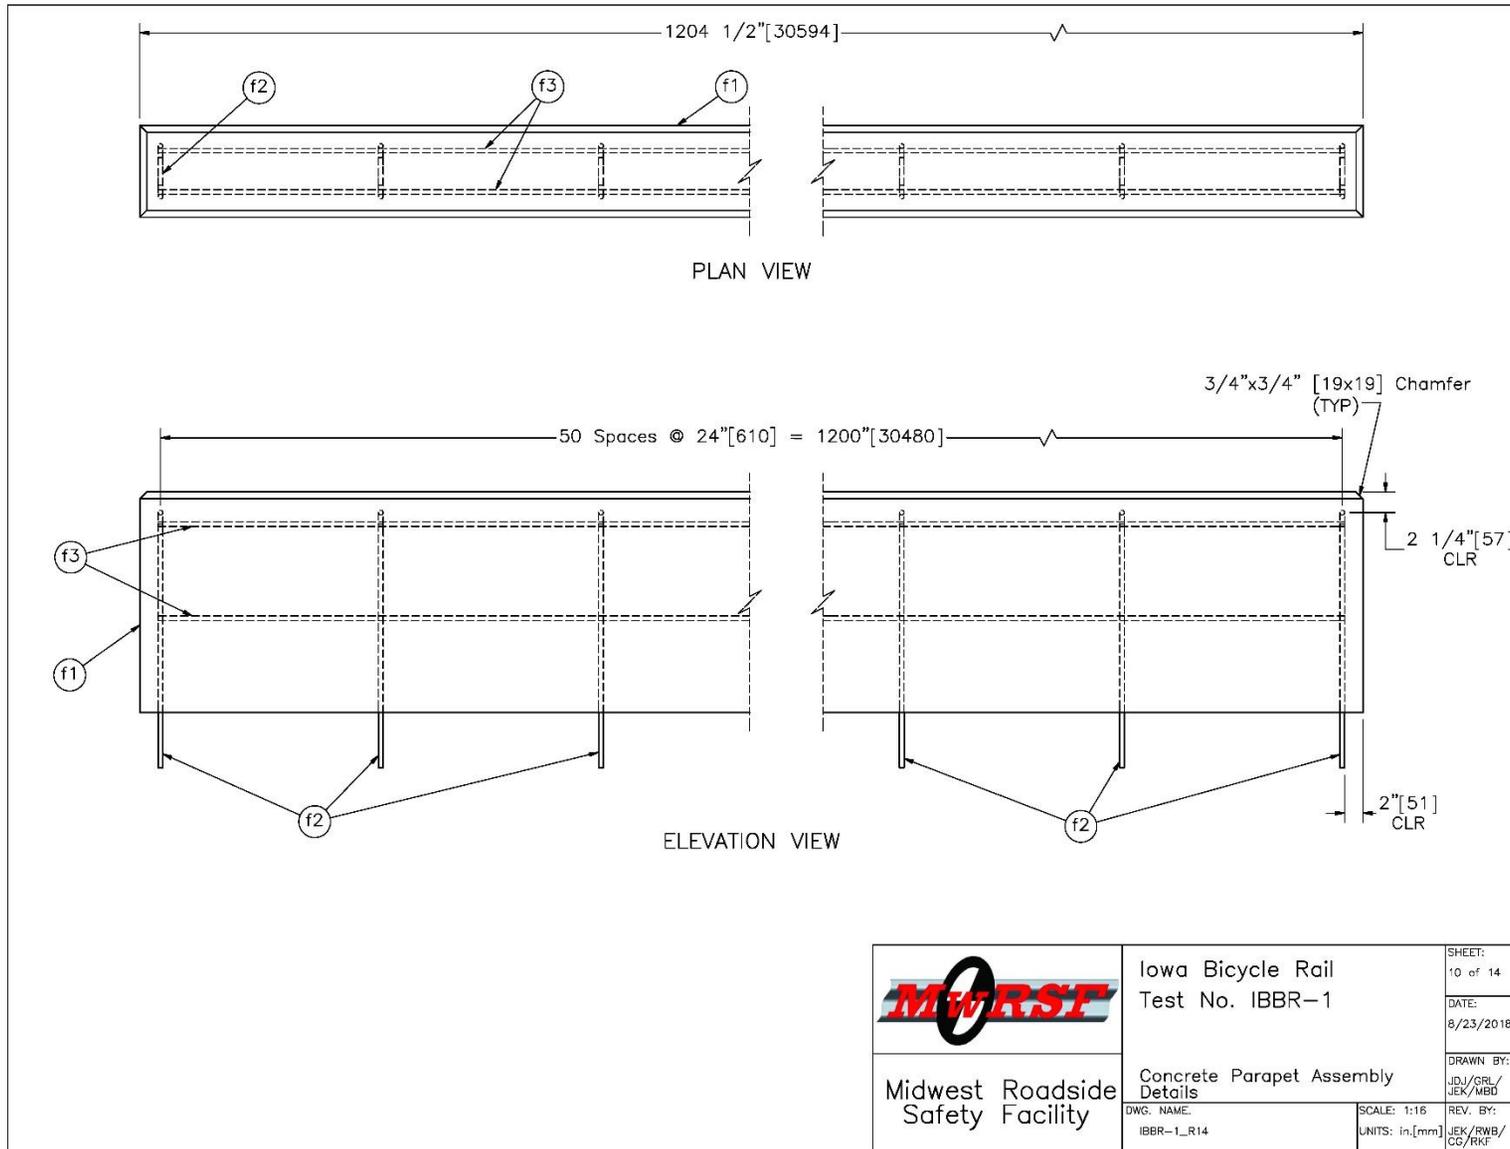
Concrete Parapet Assembly Details, Test No. IBBR-1
